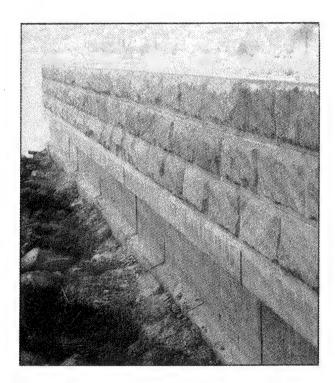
Seawall beyond line of boardwalk at Pulpit Point, Australia (from National Precast Concrete Association Australia 1991)
